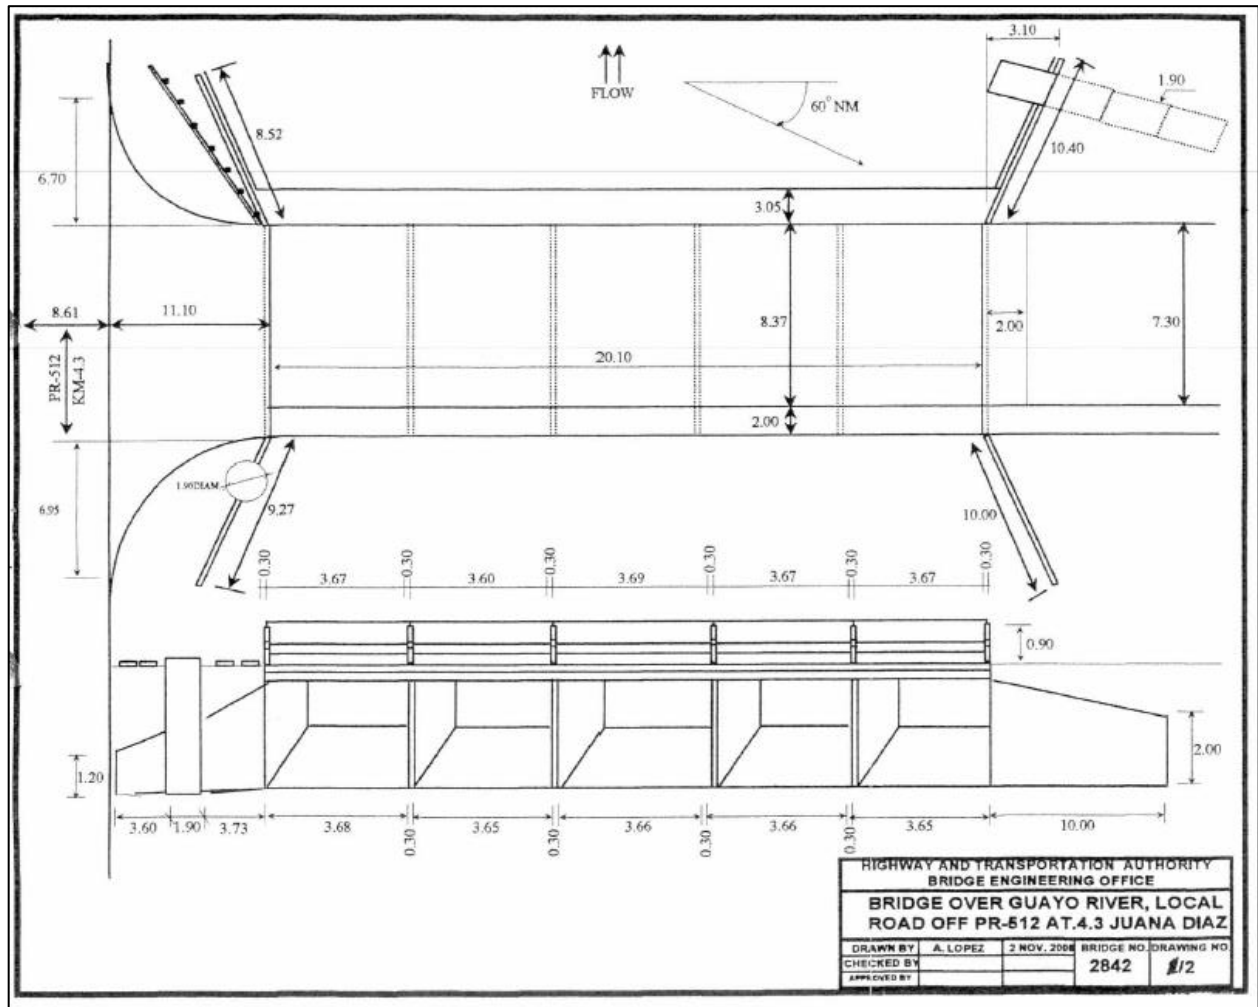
Bridge 2842 drawings (source: PRHTA)
